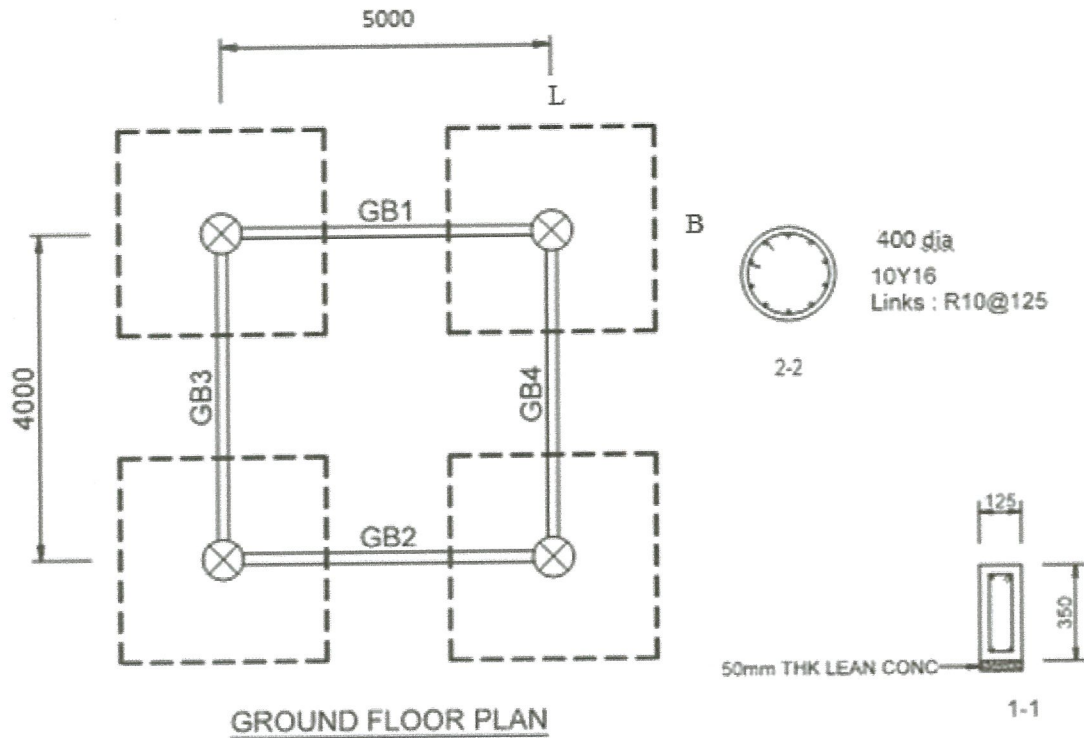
(b) : GROUND FLOOR PLAN AND CROSS SECTION GROUND BEAM
